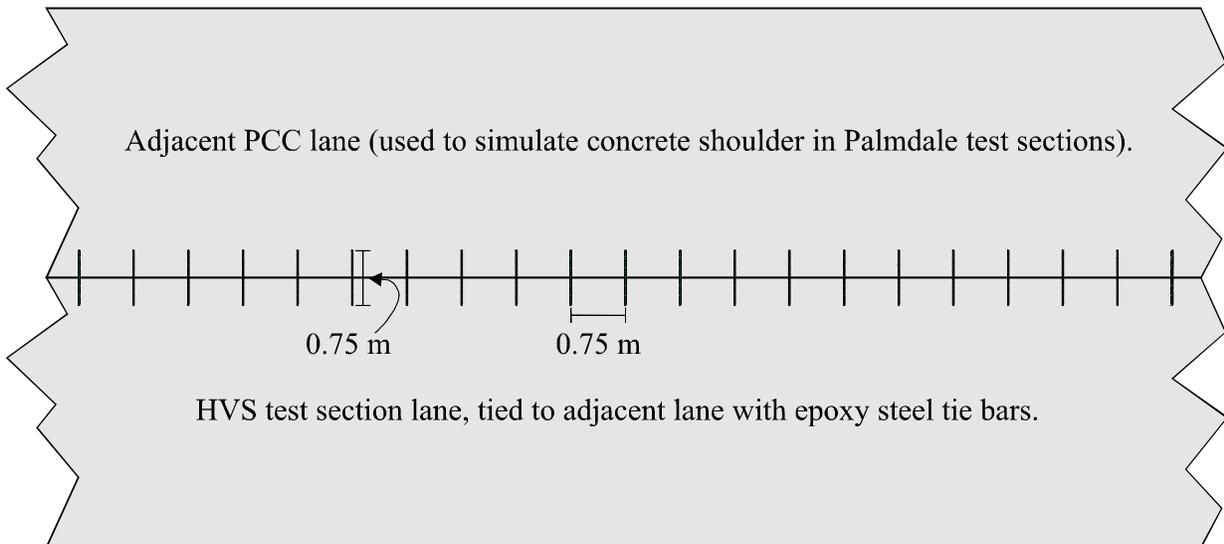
Layout and Dimensions of Dowels Used to Simulate a Tied Concrete Shoulder.
